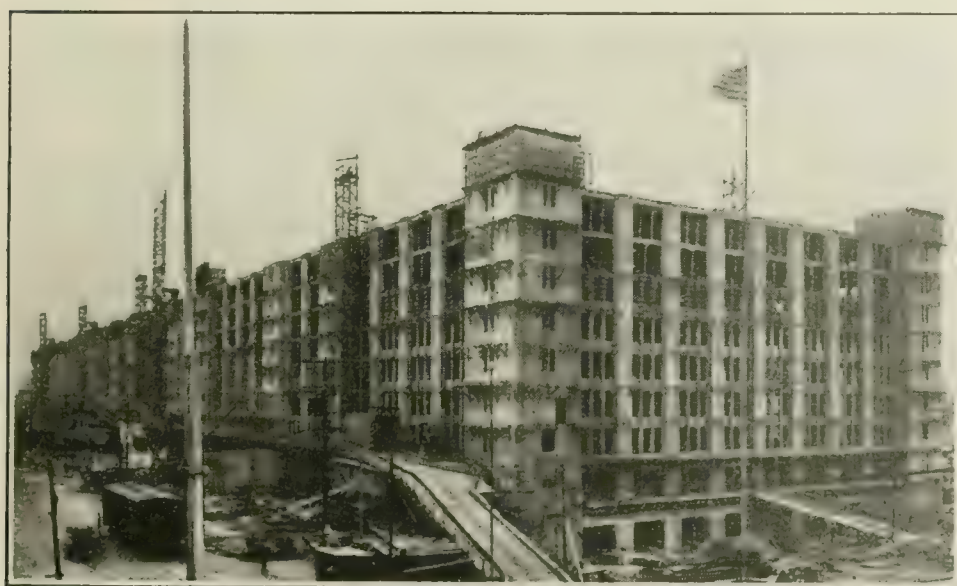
SAME AS FIG. 10, TAKEN SEPT. 23, 1918— ROOF COMPLETED.
